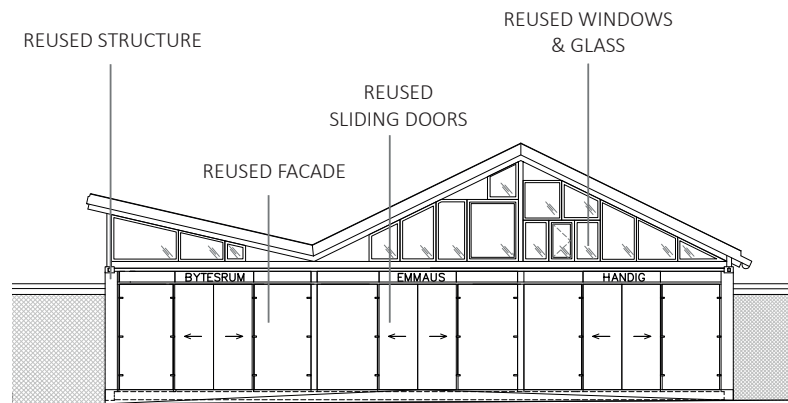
The north façade of Bråta Pavilion (Helhetshus Arkitektstudio 2016)
